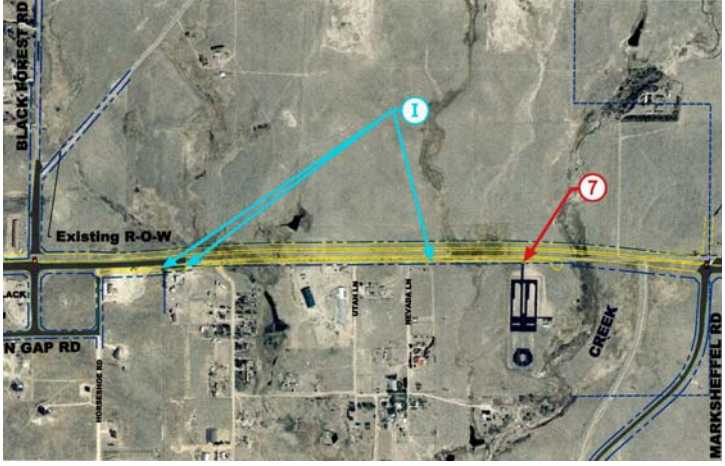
Modified Access – Black Forest Road to Marksheffel Road
